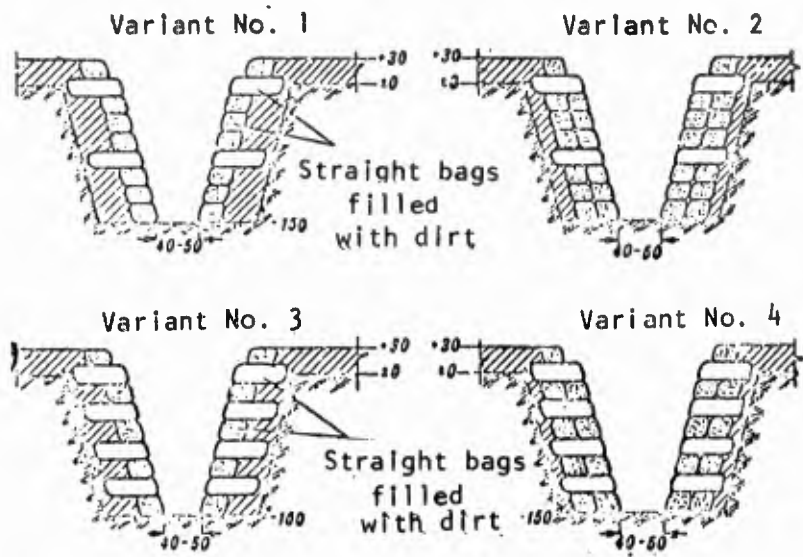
Revetment of Slopes of Trenches With Sandbags.
